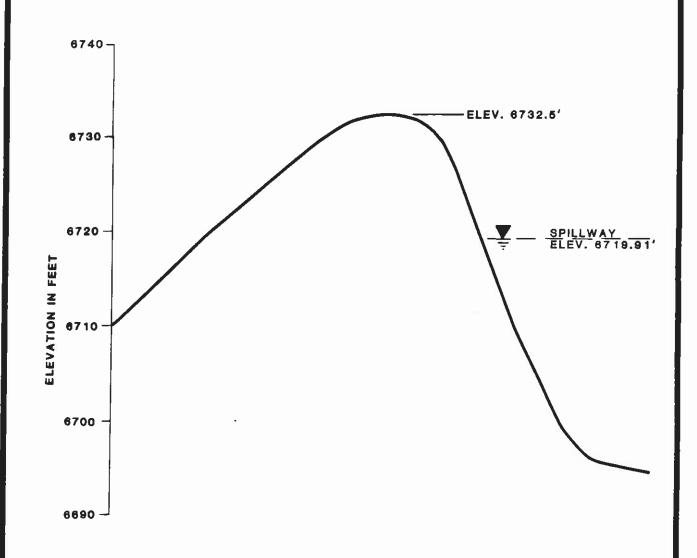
Spillway and Outflow Channel Cross Section TPF-D
